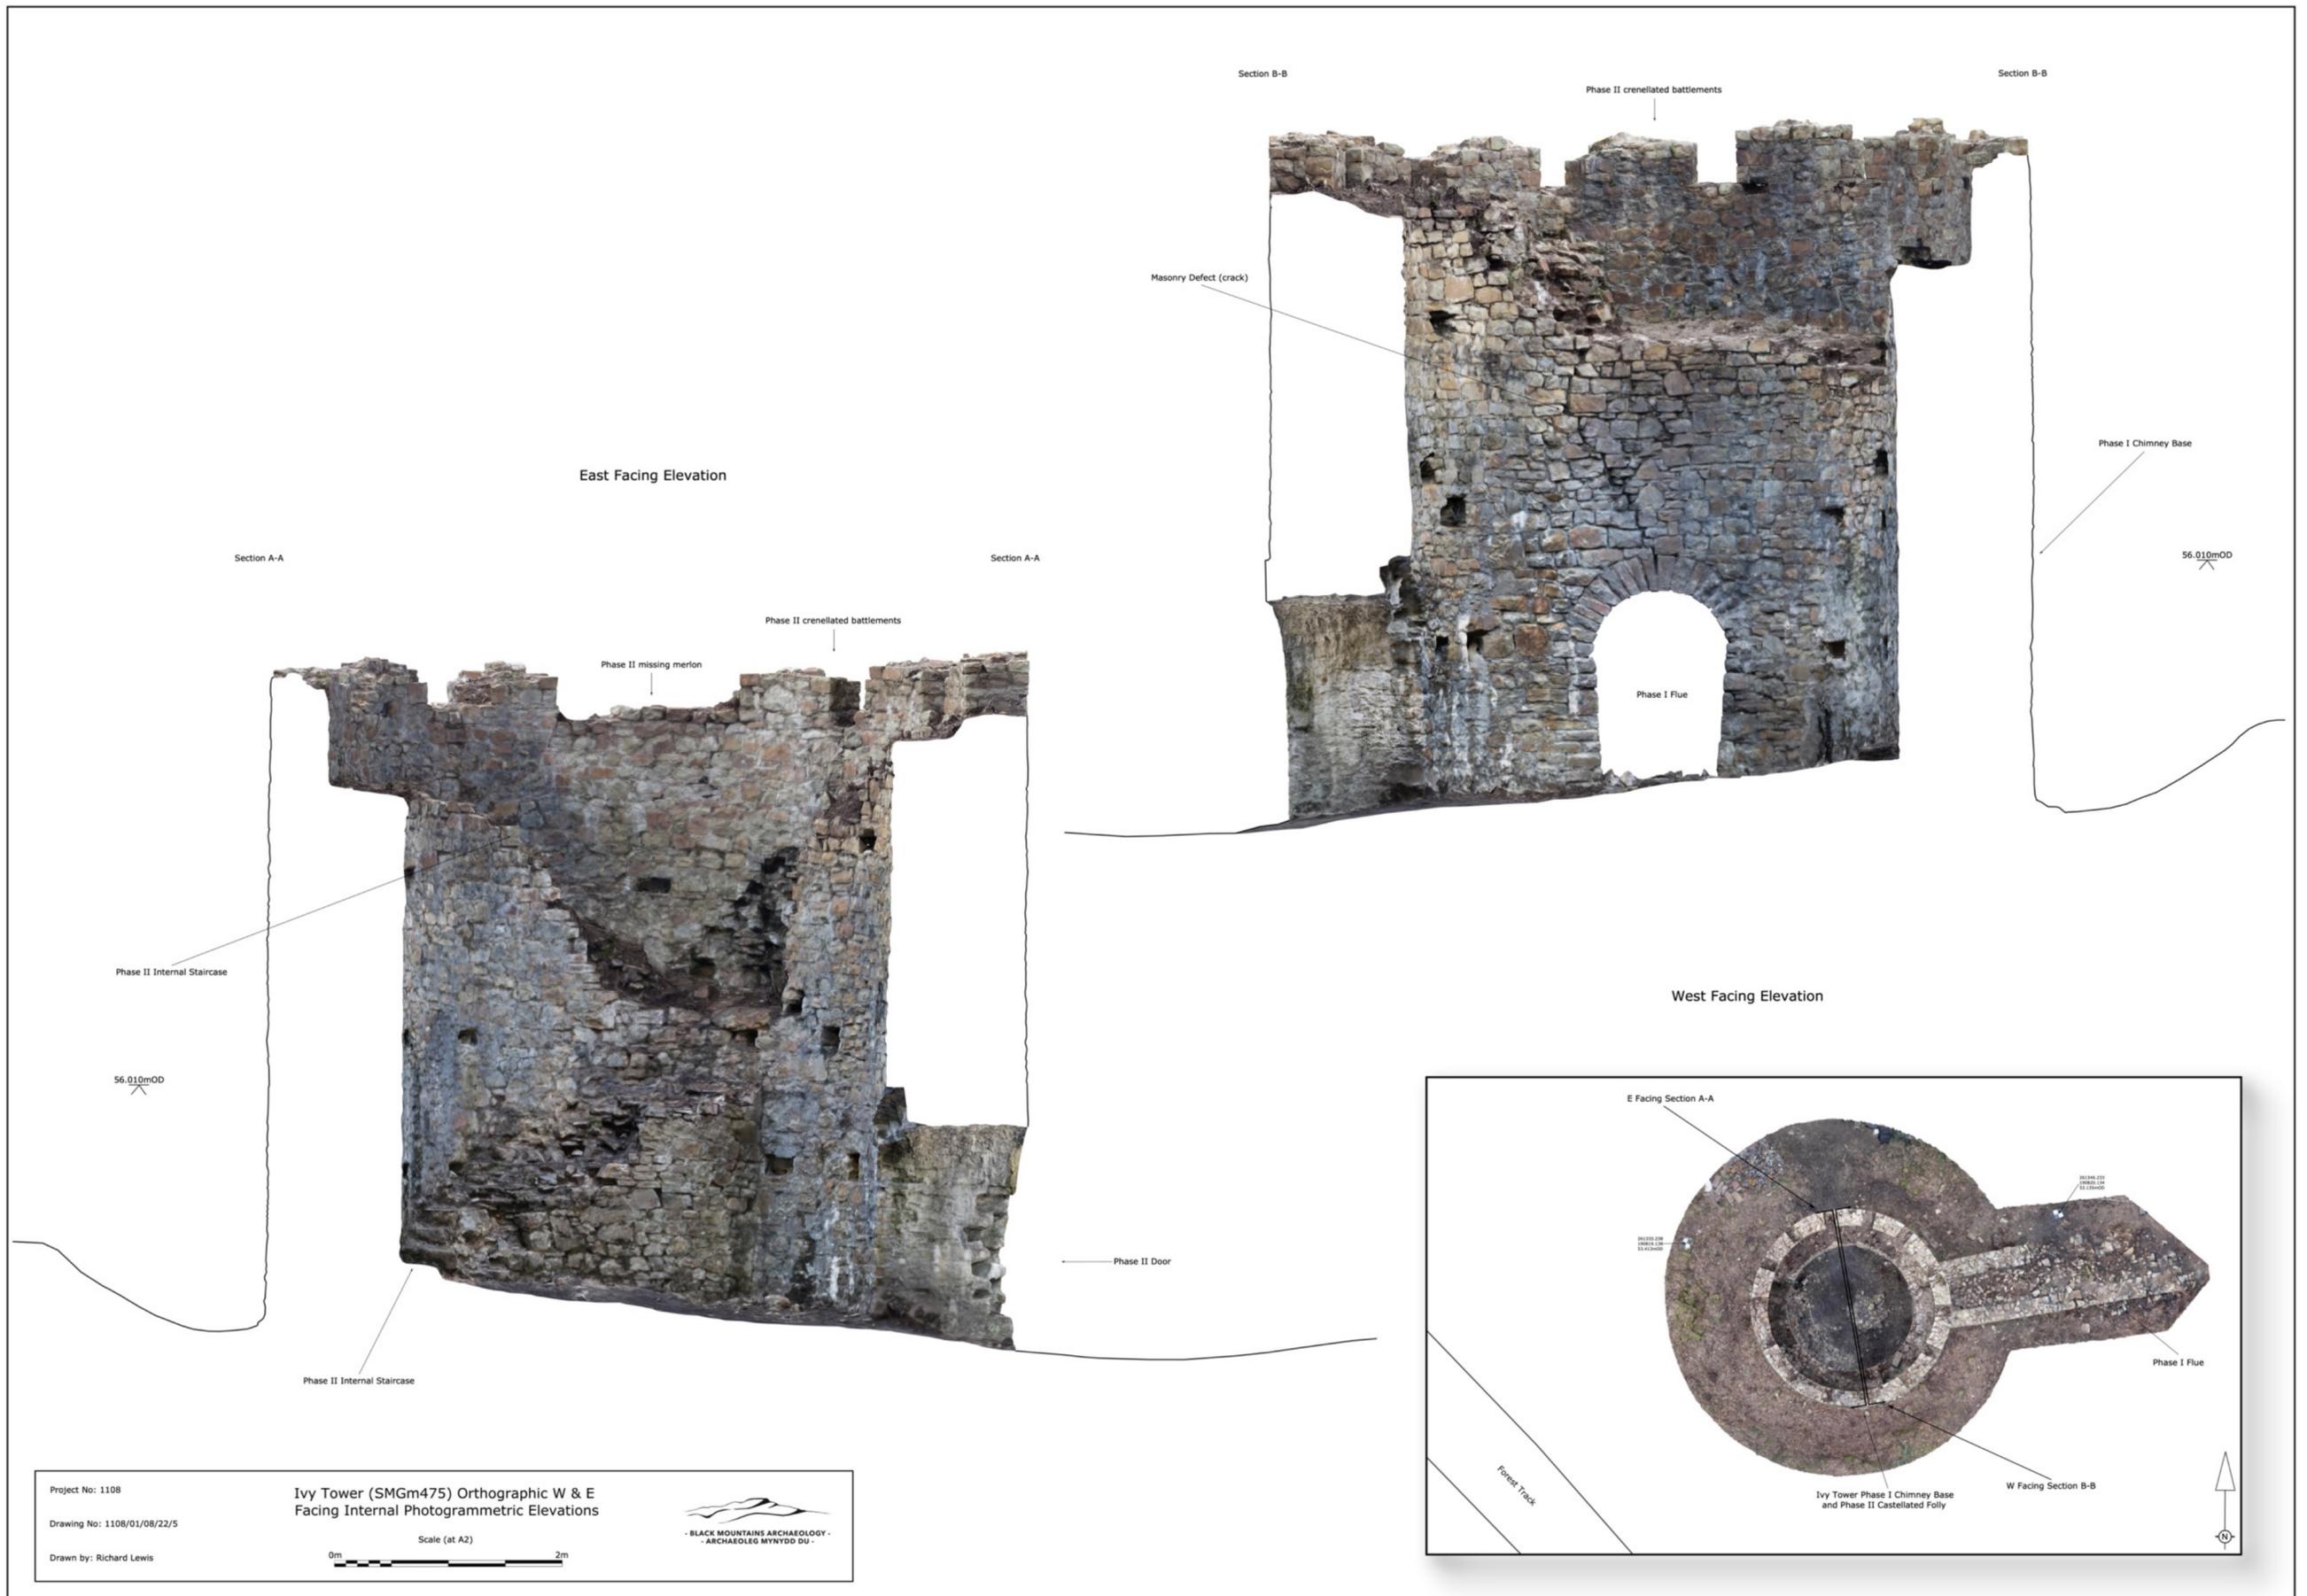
Ivy Tower Orthographic West and East Facing Internal Photogrammetric Elevations.
